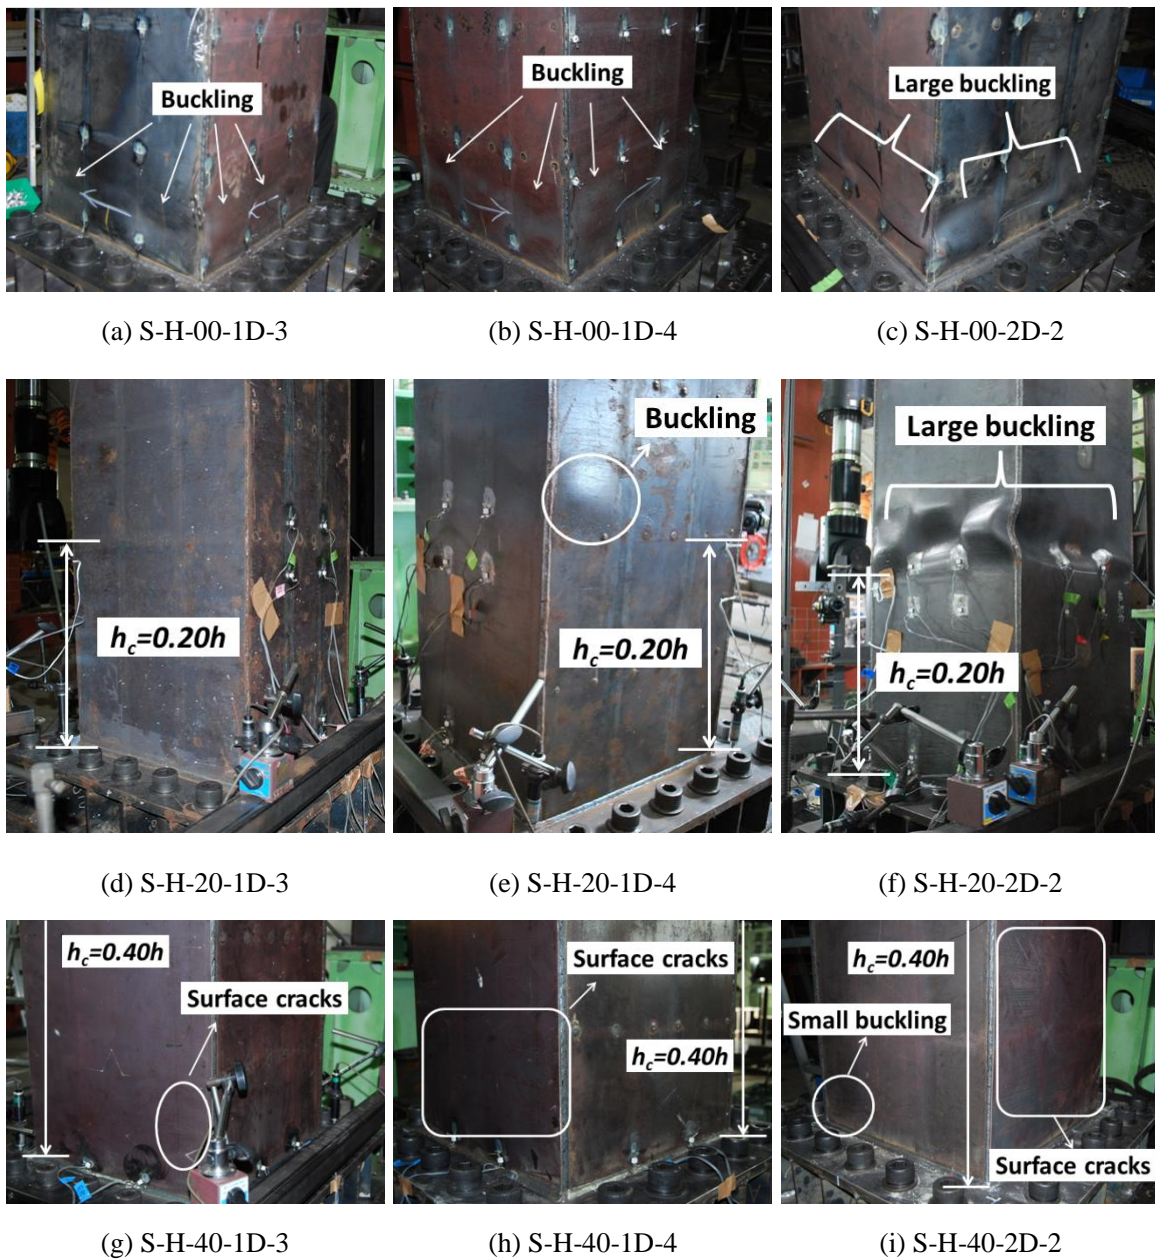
Stiffened rectangular specimens after loading tests of medium ground (GT2)
